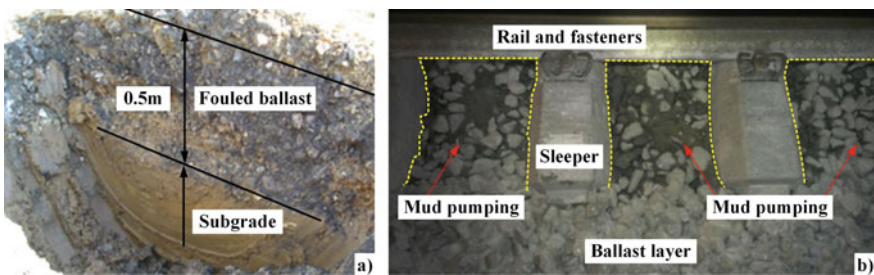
Different kinds of subgrade distresses in ballasted railway: a geological section of fouled ballast [5]; b typical mud pumping [6]
